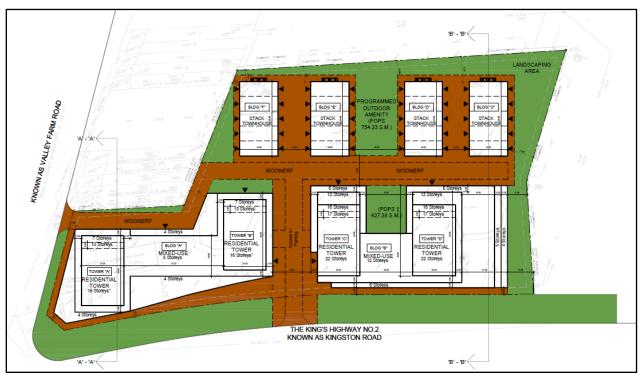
Submitted Conceptual Plan for 1550 Kingston Road
